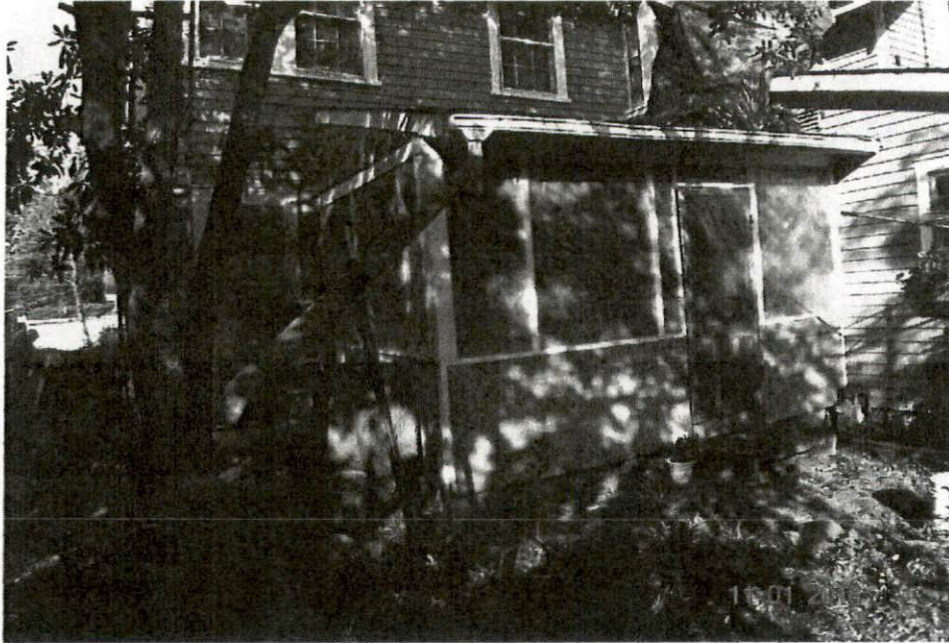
This is that tree stump. Note the failed brick face wall to the left. There is also a pier in that area that failed.
